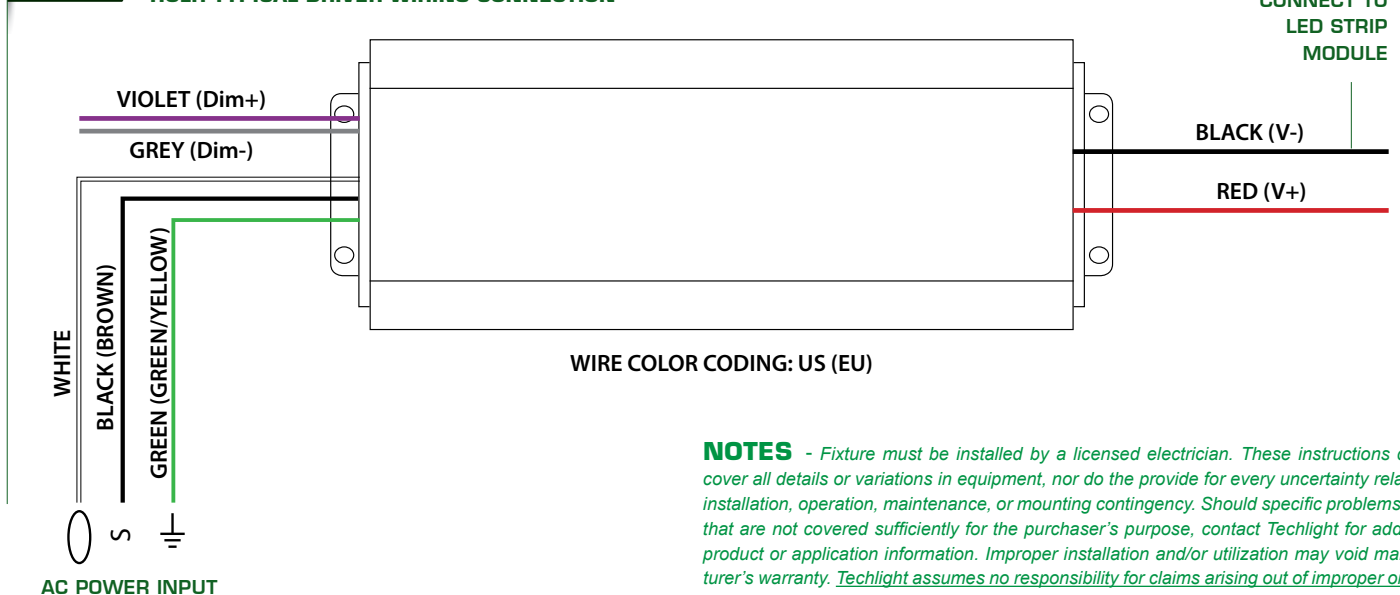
HOLH TYPICAL DRIVER WIRING CONNECTION
